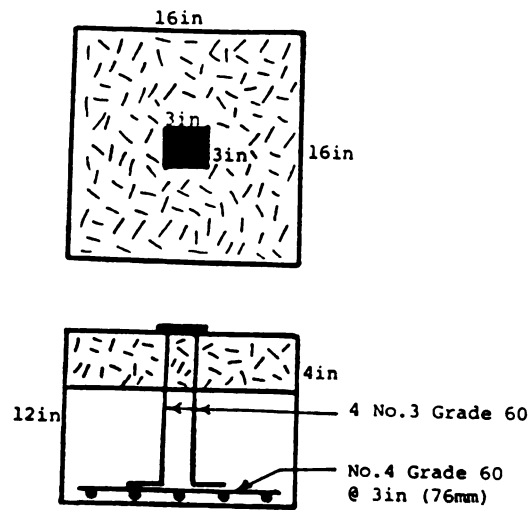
Bearing test specimens. 1 in = 25.4 mm
